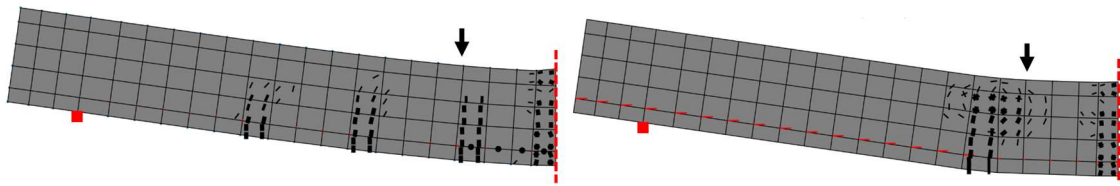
Crack patterns in corroded beam B116 at flexural failure (left) and at bond-slip failure (right).
